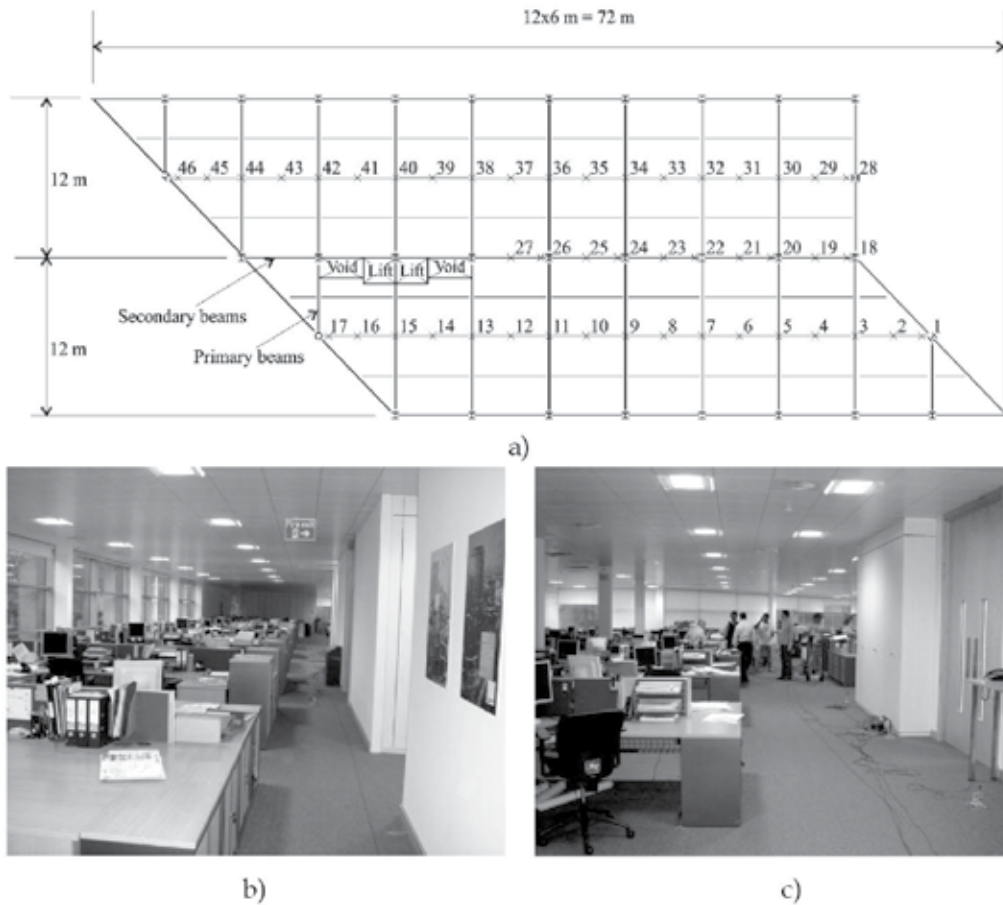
Floor structure. a) Plan of the floor (not to scale); (x) measurement point used in the EMA. b) View from TP 44 towards TP 28. c) View from TP 12 to TP 01
